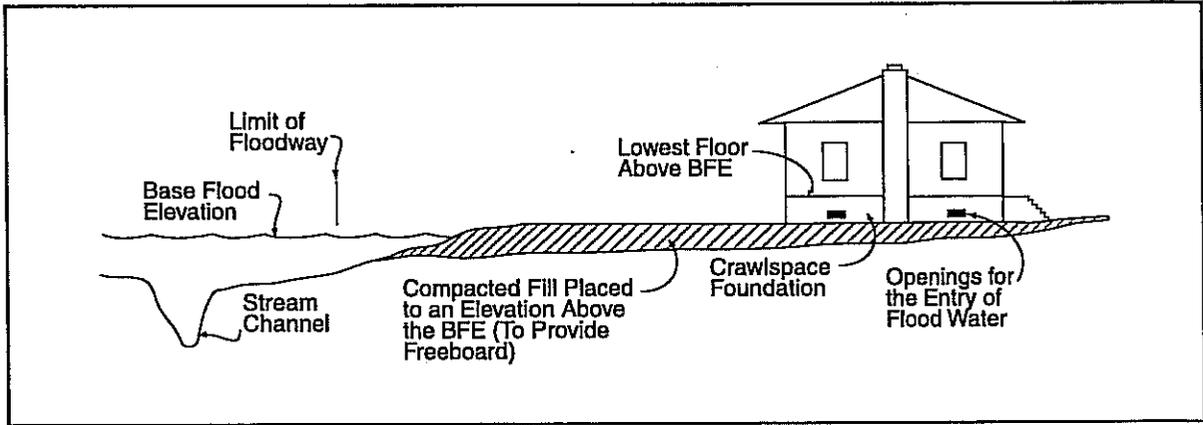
Structure on a crawlspace foundation. The lowest floor is raised above the BFE. Openings in the foundation walls allow water from floods higher than the fill elevation to enter the crawlspace and equalize the pressure on foundation walls.
